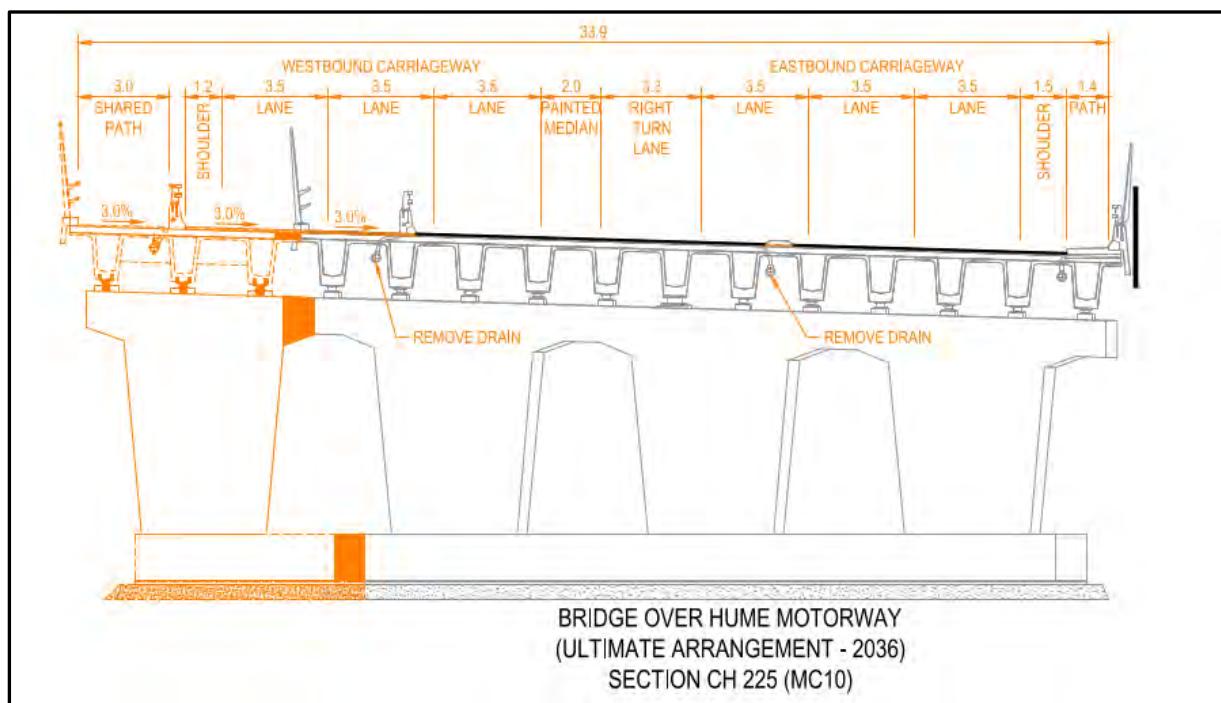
Proposed new bridge cross section arrangement in 2036
